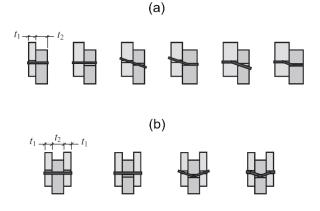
Plastic failure modes of (a): non-symmetric timber-to-timber connections; (b) symmetric timber-to-timber connections. Adapted from *BS EN 1995* [1].
